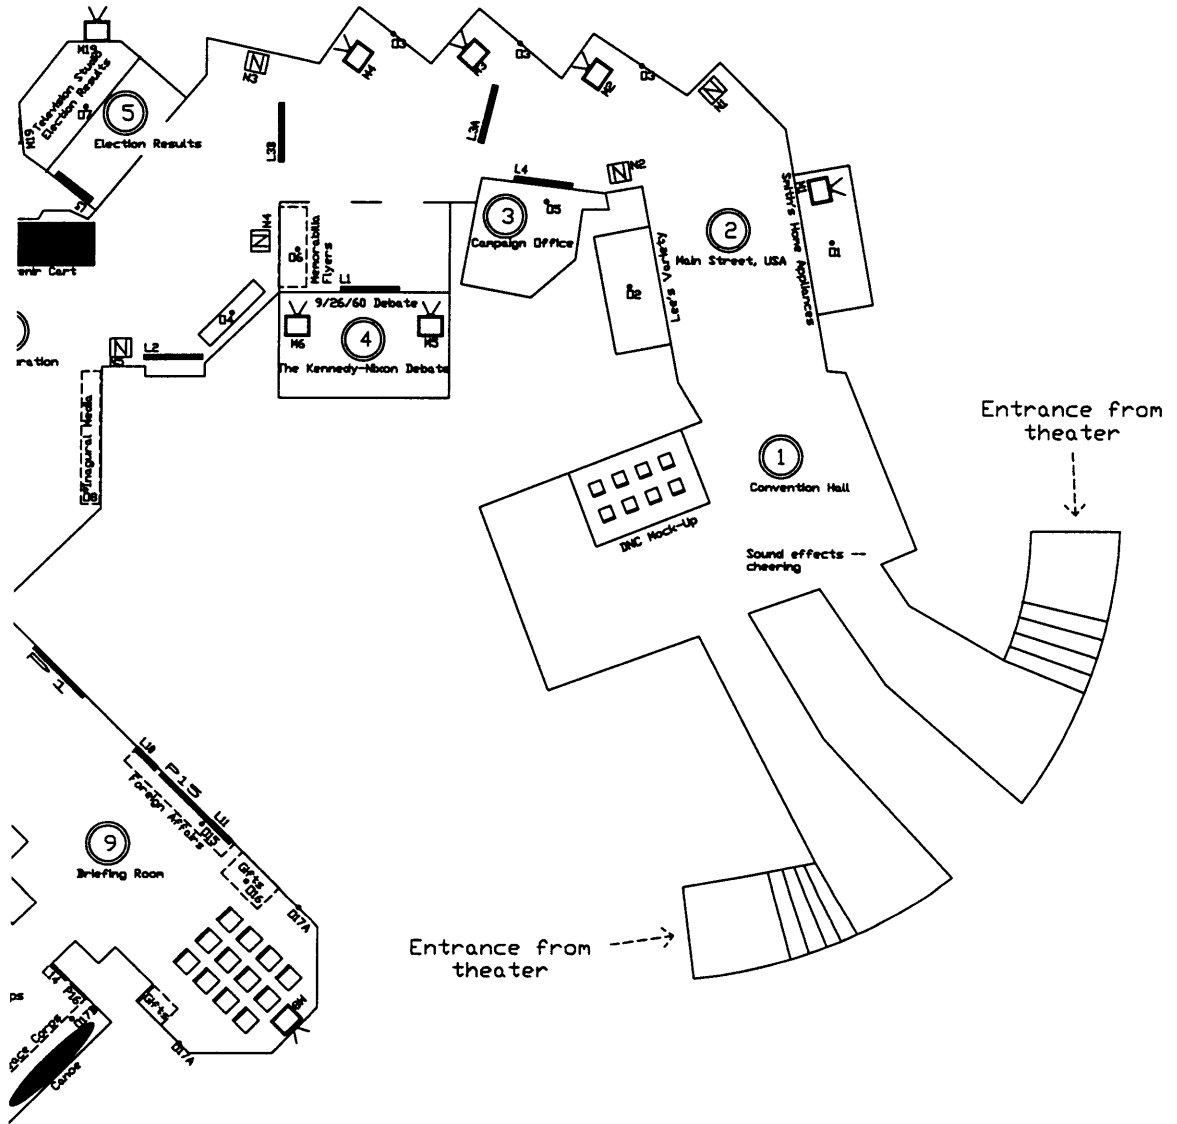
First section of the floor plan of the Kennedy Museum.
